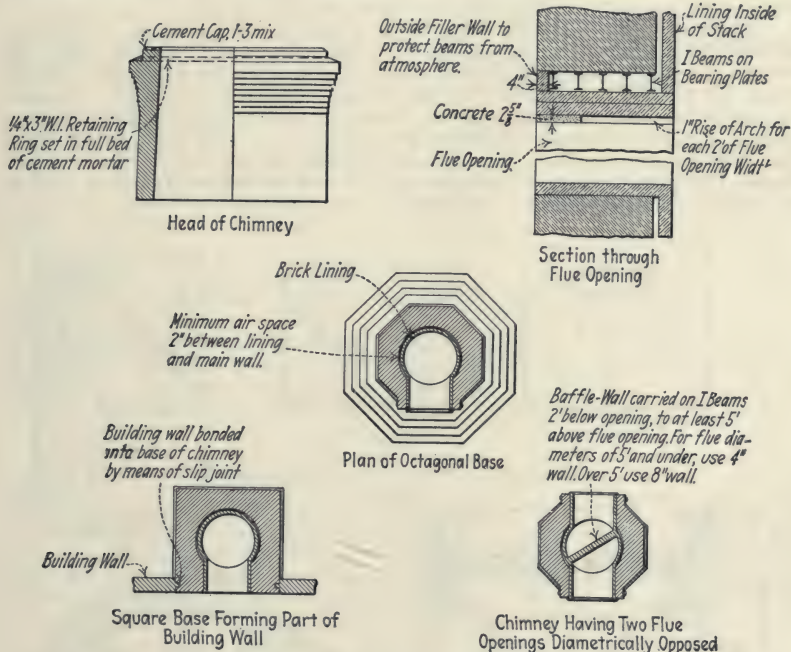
Typical Details of Radial Brick Chimney Construction.
